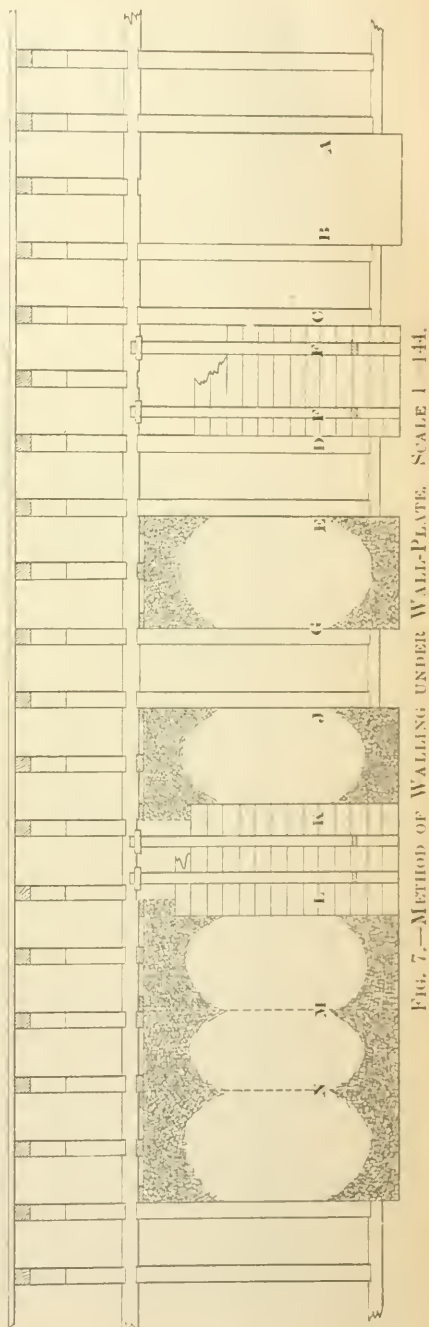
METHOD OF WALLING UNDER WALL-PLATE. SCALE 1=144.
